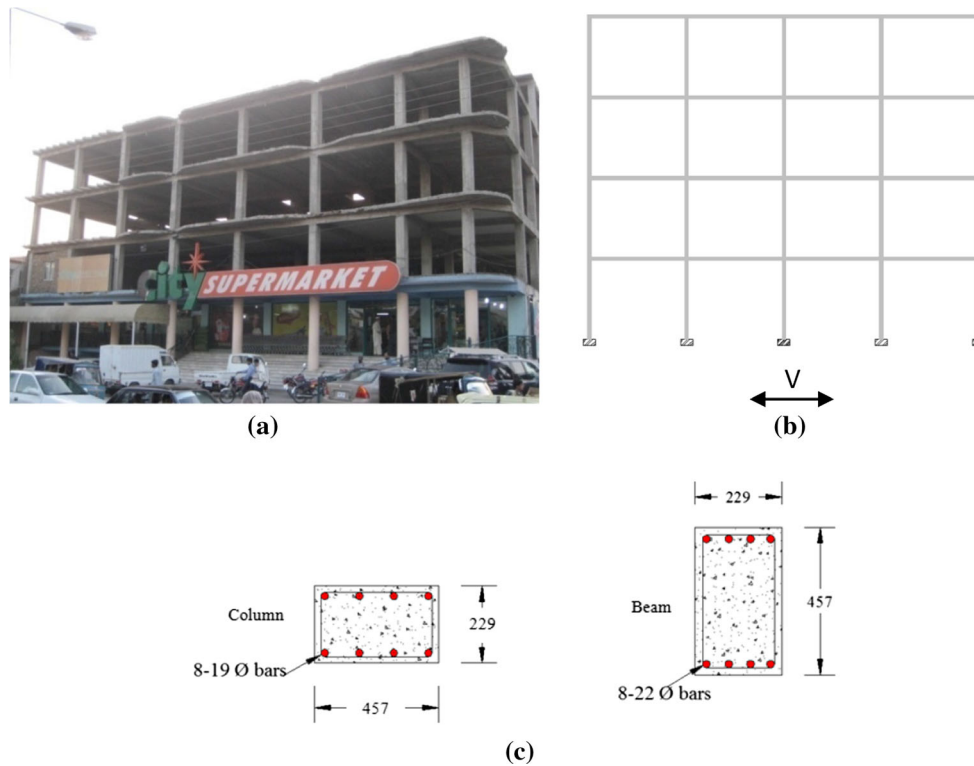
a, b Typical four-storey RC structure in the study area, c Column and beam section and reinforcement details
